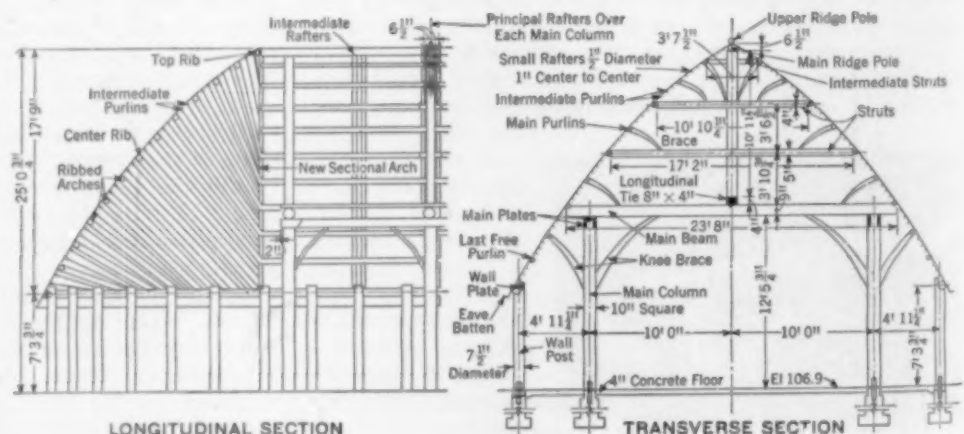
LONGITUDINAL AND TRANSVERSE SECTION
